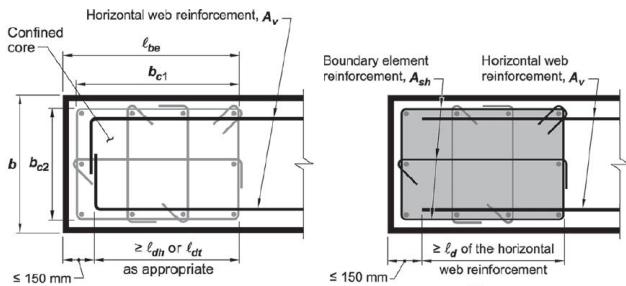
Details of special boundary element in ACI 318M-14 [15]
